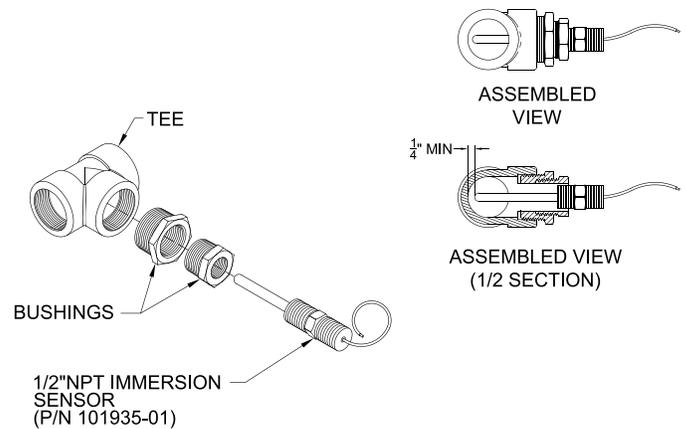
Recommended Direct Immersion Header Sensor Installation Detail
